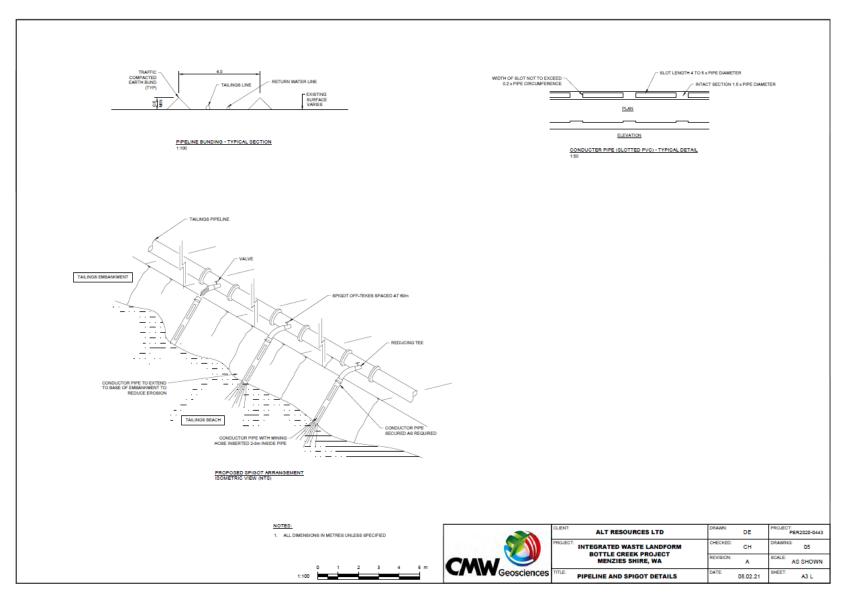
Integrated Waste Landform Tailings Storage Facility - Pipeline and Spigot details
